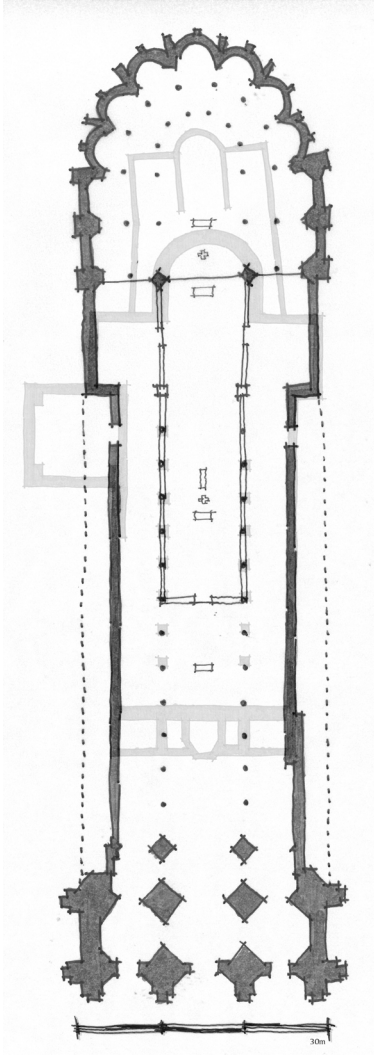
Reconstructed Plan of Fulrad's Church ca 1080CE
